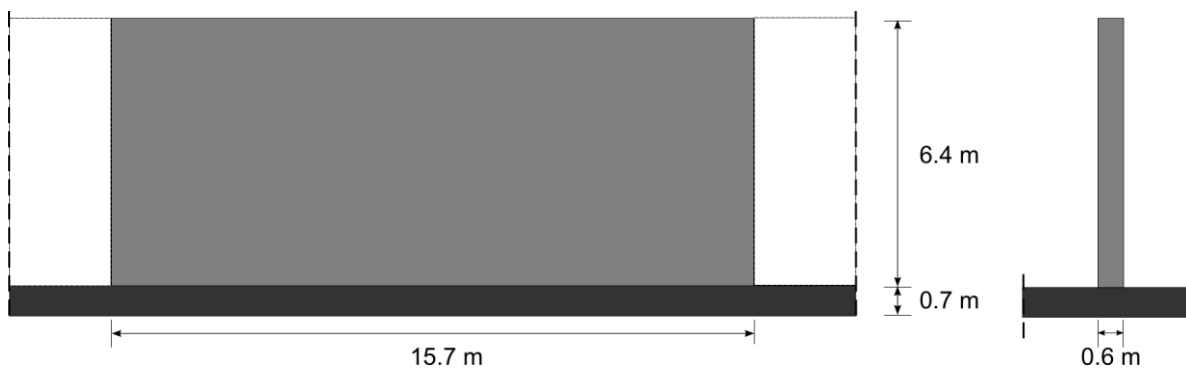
Geometry of the tank wall segment: (a) longitudinal view; (b) cross-section.
